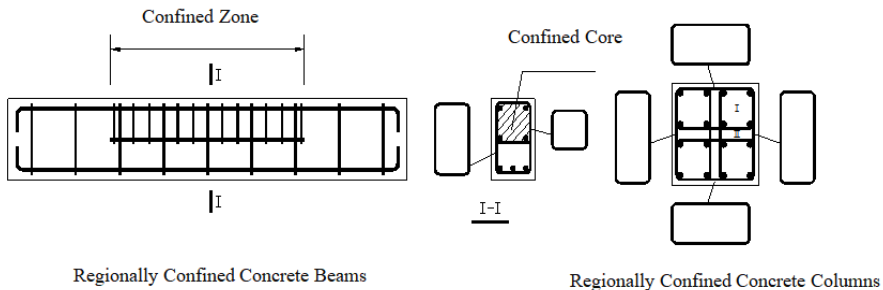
Typical Reinforcement of Restrained Concrete Beams and Columns in Area Constraints
